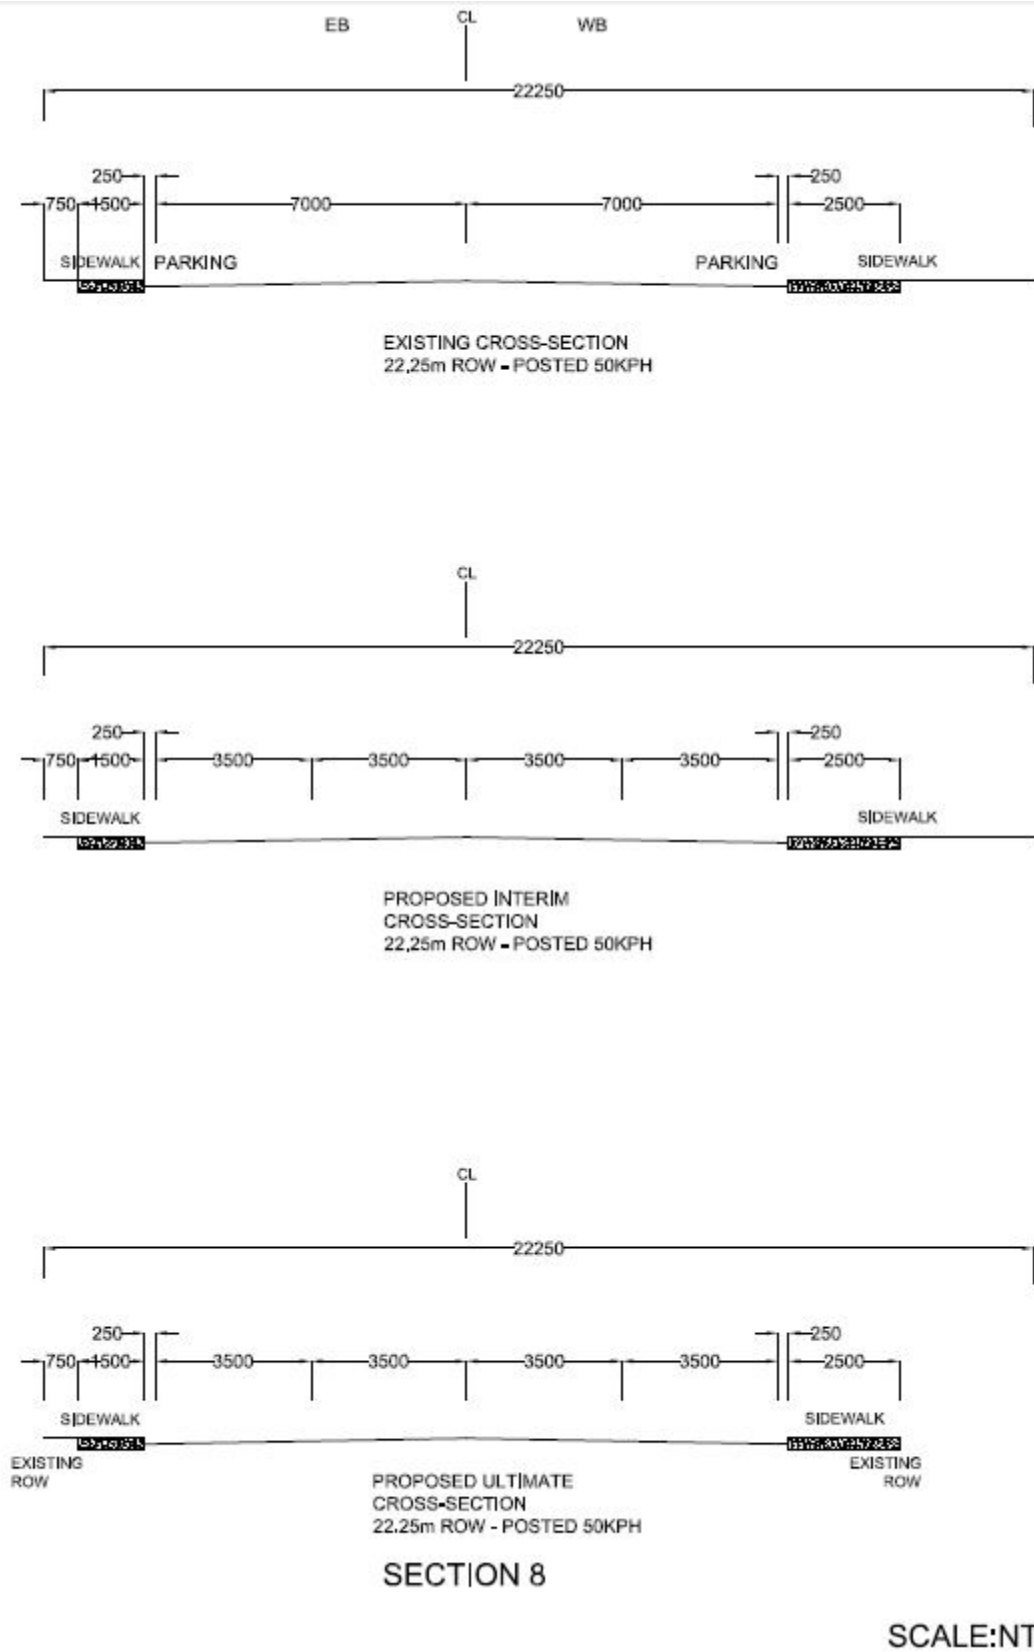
Proposed Section 8 – Hwy 22 West of 3rd Street West
